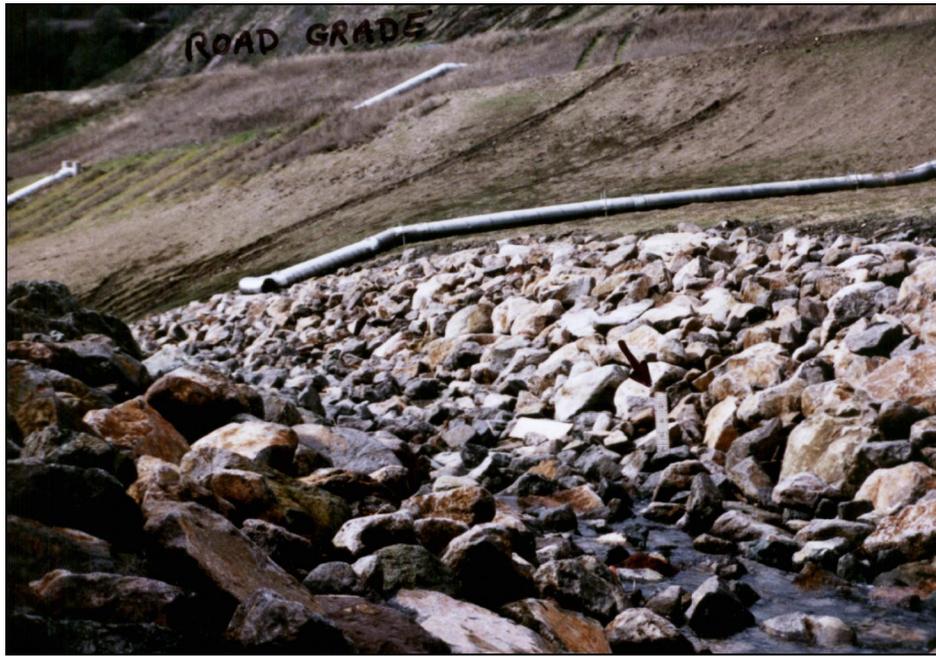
Repaired channel with CA 1-ton RSP-class and oversized rock allowed. D/S view. "ROAD GRADE" about 6 %. Channel grade transitions from 2.5% (at 30-inch high z-scale marked with arrow) to about 21% past upper (closest) down drain. Concrete anchors for cable-stays are below the bench hinge point of the lower down drain (left edge of image). Both down drains are 18-inch steel pipe.
